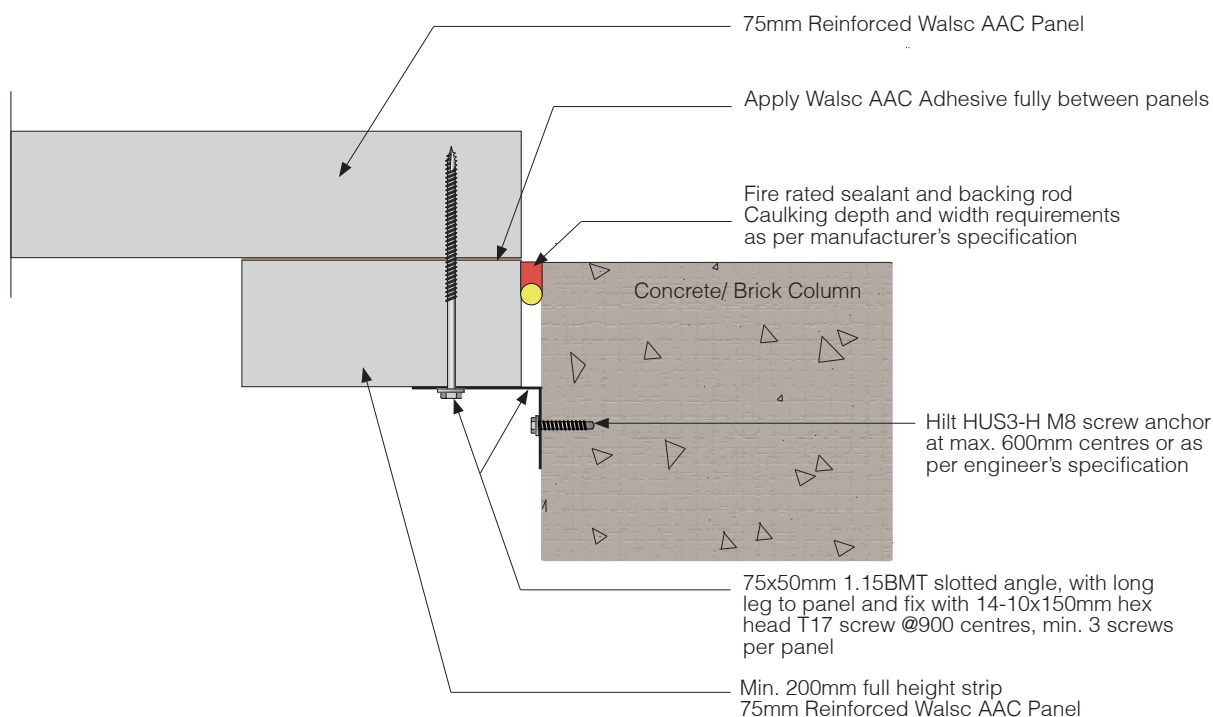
Offset Panel to Concrete/ Brick Column Detail
